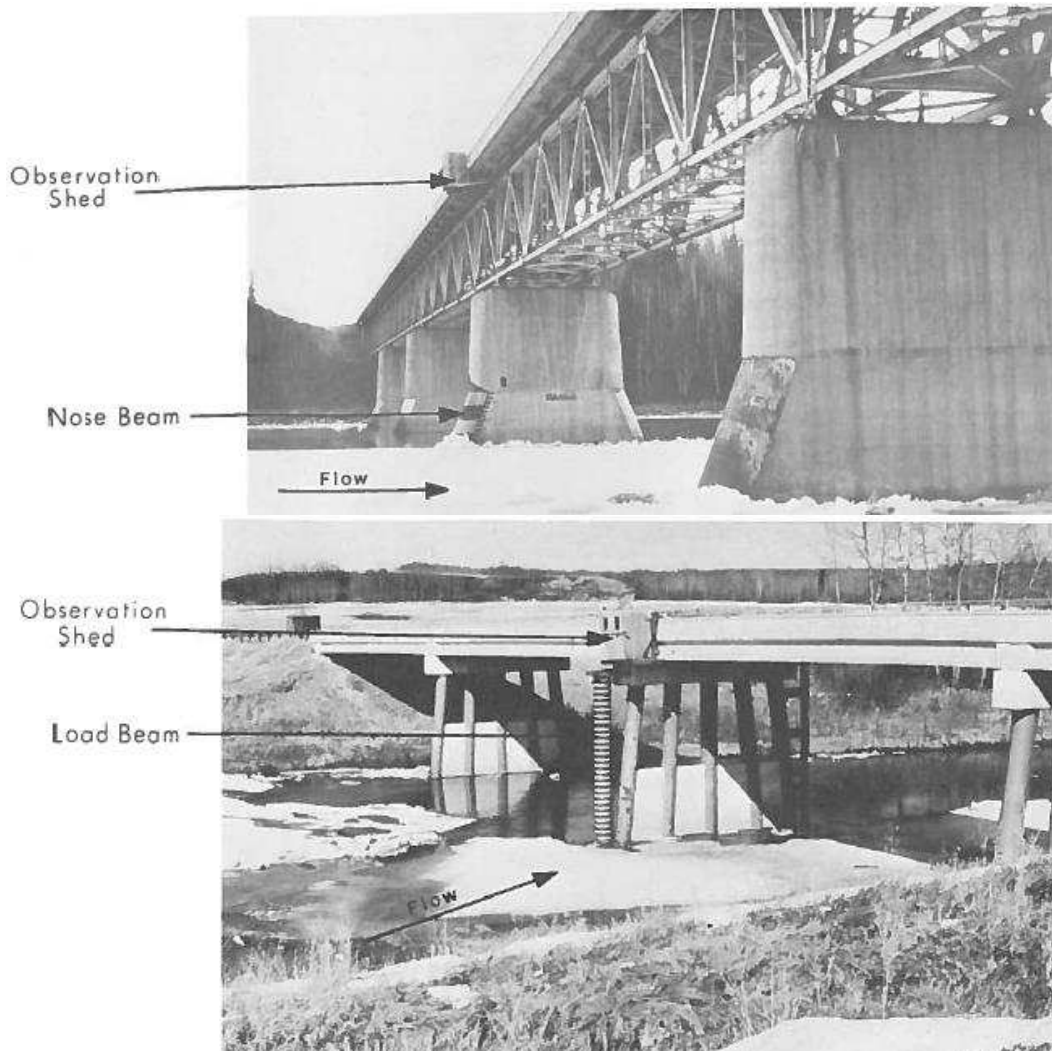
Top) Hondo bridge pier. Bottom) Pembridge bridge pier. From Lipsett and Gerard, 1980.
